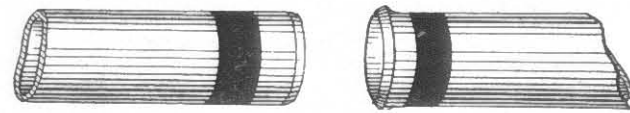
Wiped Underhand Joint: Pipes ready for joining.
